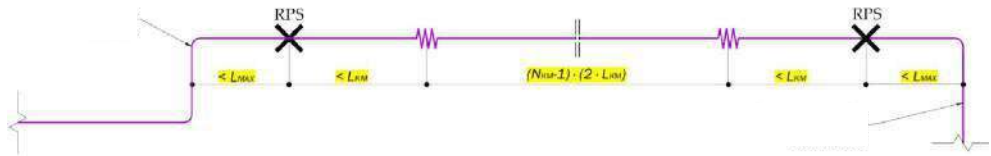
Use of real fixed points between extreme compensators and compensating elbows
